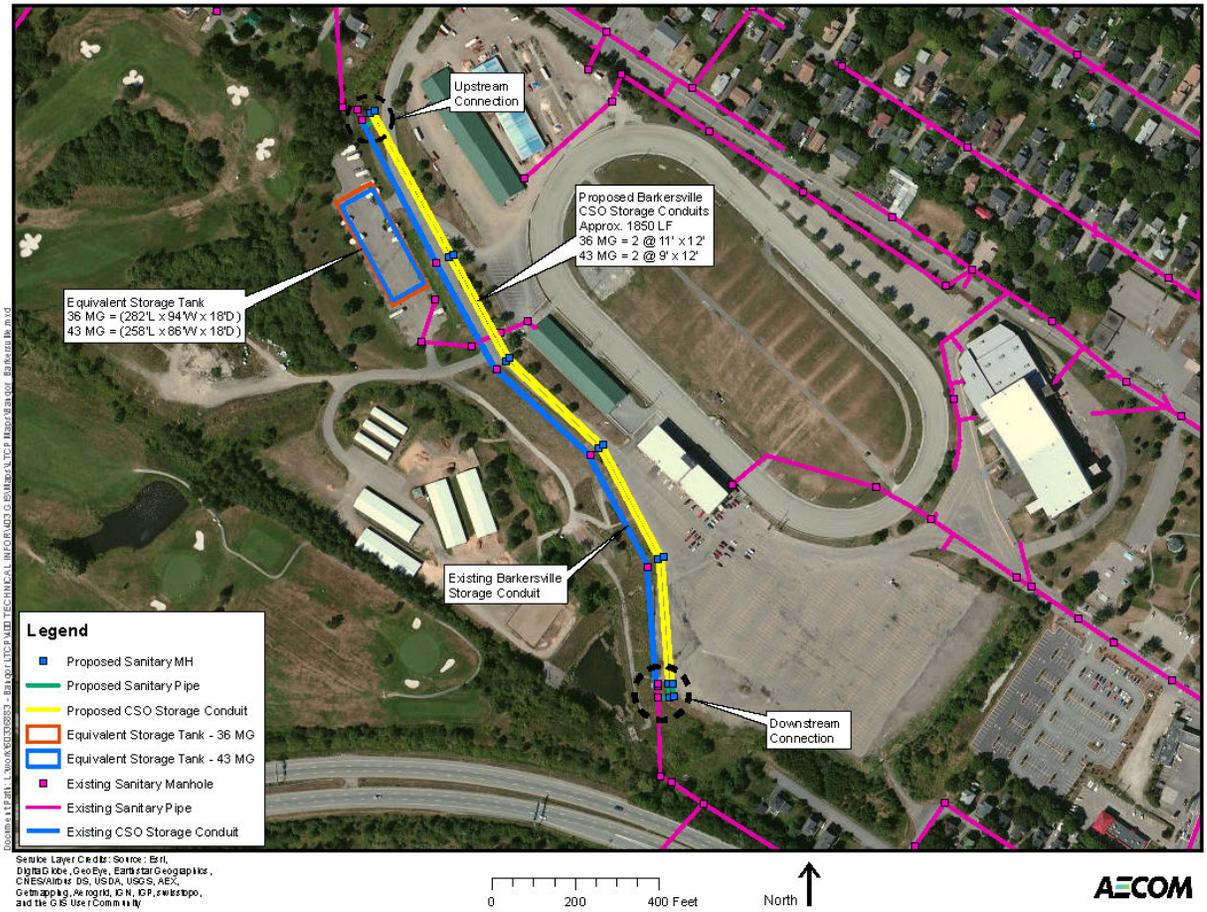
Barkersville Storage Tank and Storage Conduit Layouts
